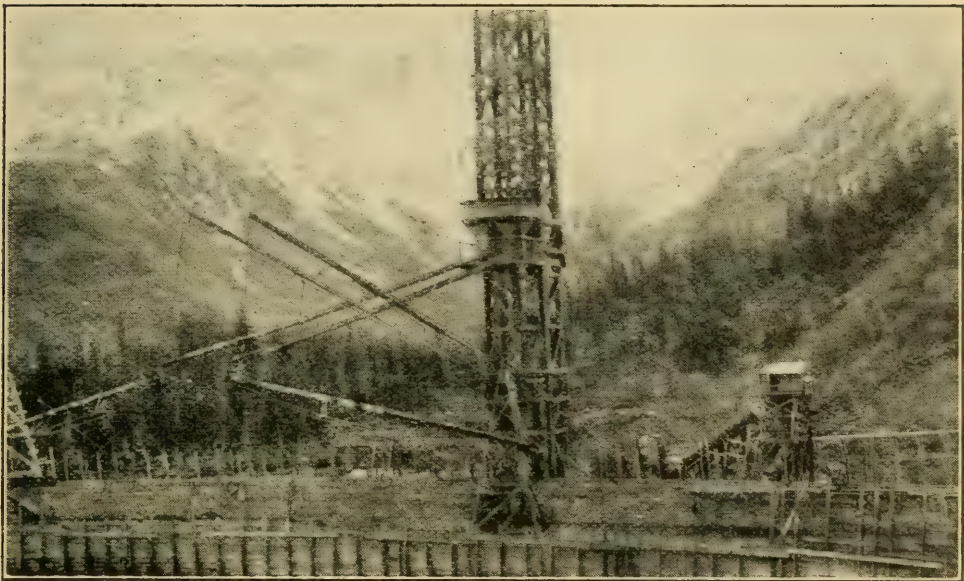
SALMON CREEK DAM. DETAILS OF TOWER AND DISTRIBUTING SYSTEM FOR CONCRETE.
